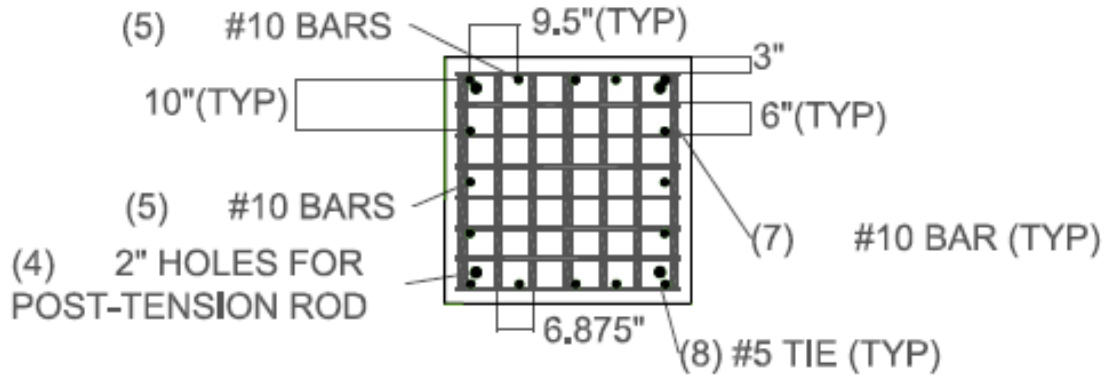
Top View of Concrete Block Reinforcement (C-C)
